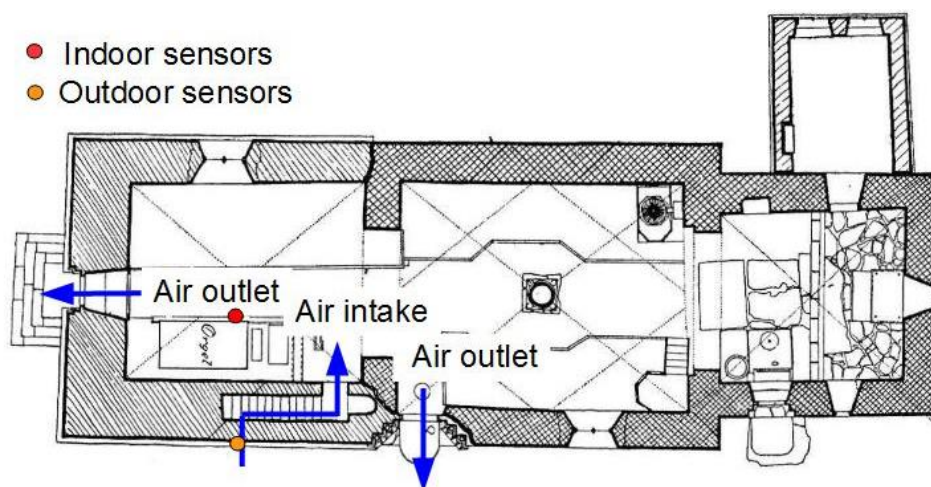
Floor plan over Hangvar church with indication of sensor and actuator position
